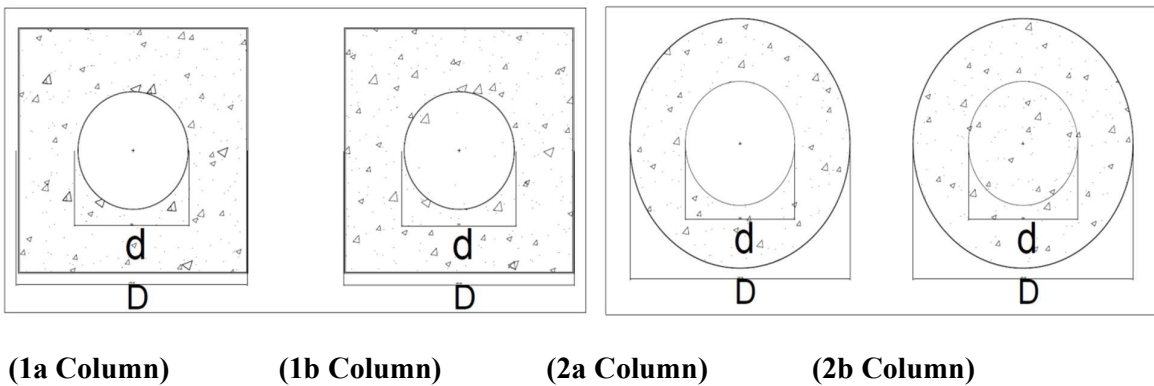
and 1b CFDST Column Plan Figure ii: 2a and 2b CFDST Column Plan
